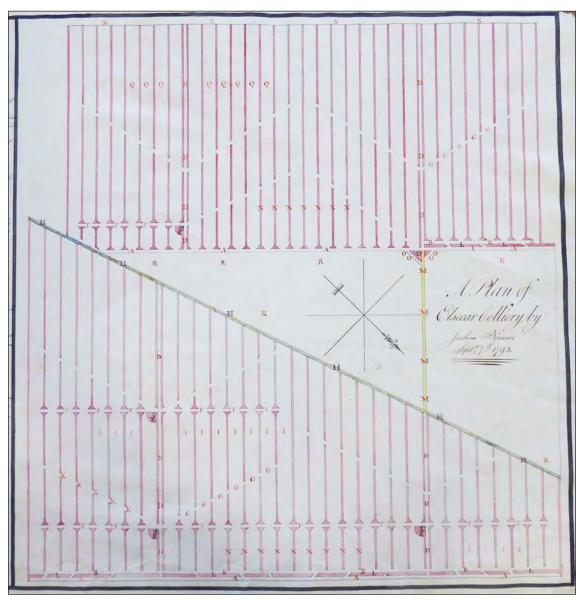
A Plan of Elsecar Colliery by Joshua Biram, September 7th 1793. The plan is schematic and idealised, with north oriented bottom right. The fault separates coal on two levels, as clearly shown on the accompanying section drawing (Figure 11). Reproduced courtesy of Sheffield City Archives, WWM MP 56 (see note in Archival Sources).
